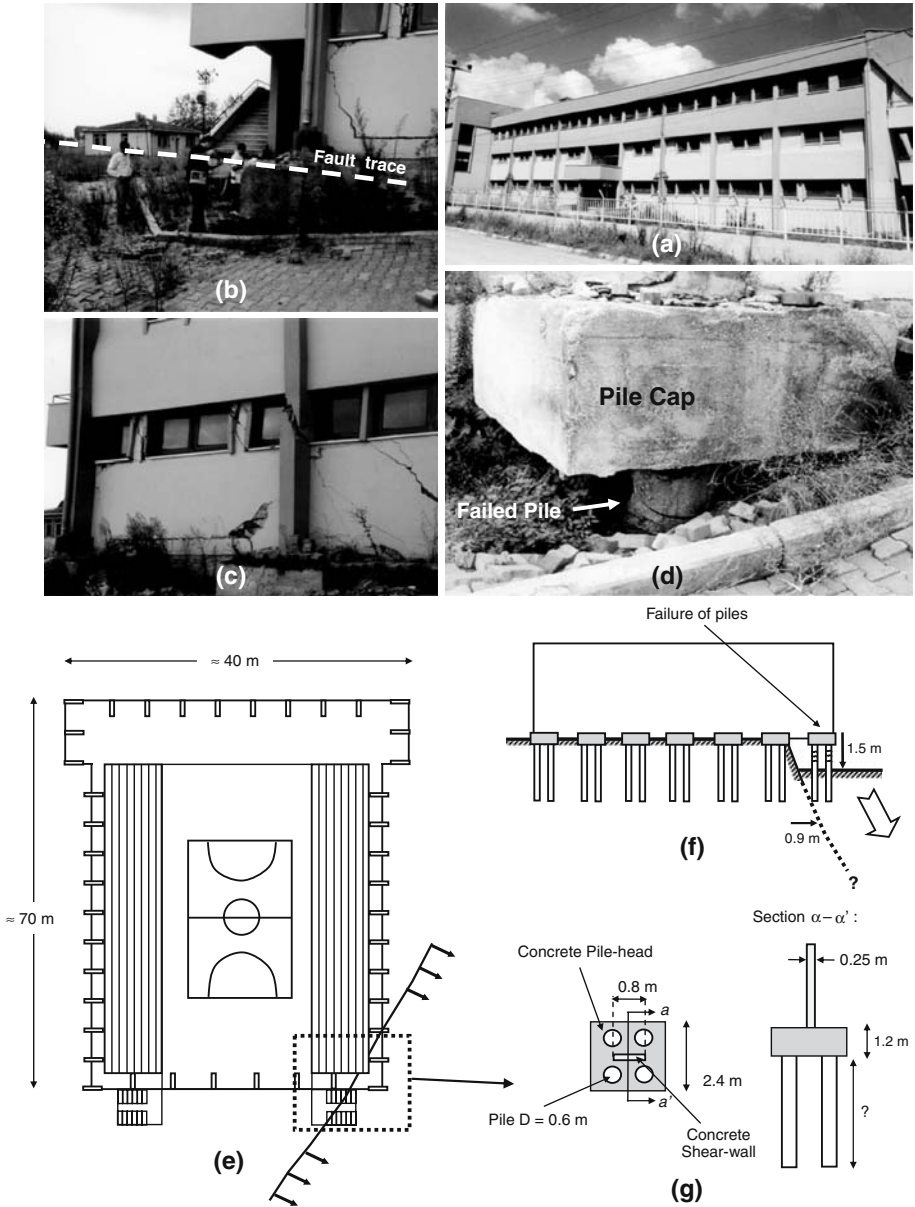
Basketball Court; Severe Local Damage: (a) panoramic photo of the building, (b) photo of the building’s corner crossed by the fault trace, (c) shear damage due to the imposed differential settlement, (d) tensile failure of the piled foundation, (e) schematic plan view of the building, along with the rupture trace, (f) cross-section showing the fault displacement and the damage to the (pulled-down) piles, and (g) detail of the foundation
